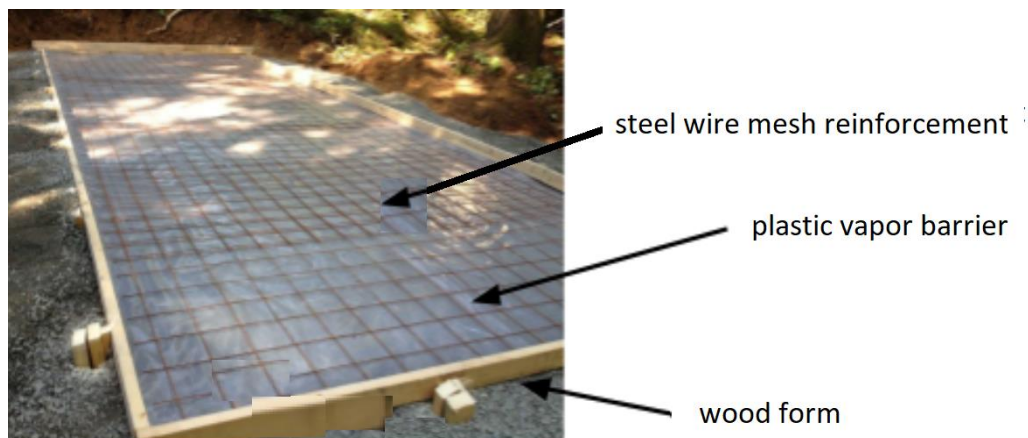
Wire mesh reinforcement prior to concrete being poured within the wood forms
